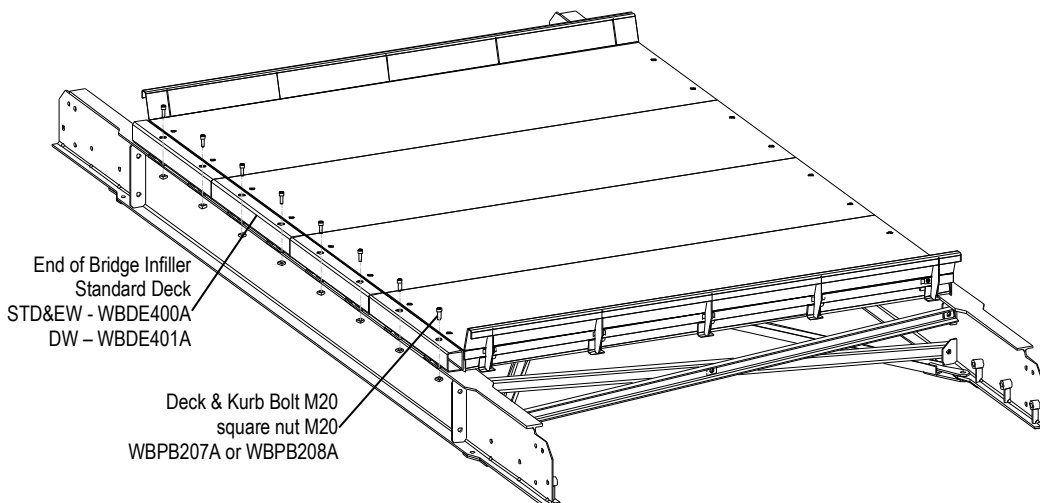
CONNECTION OF THE End of bridge infiller
